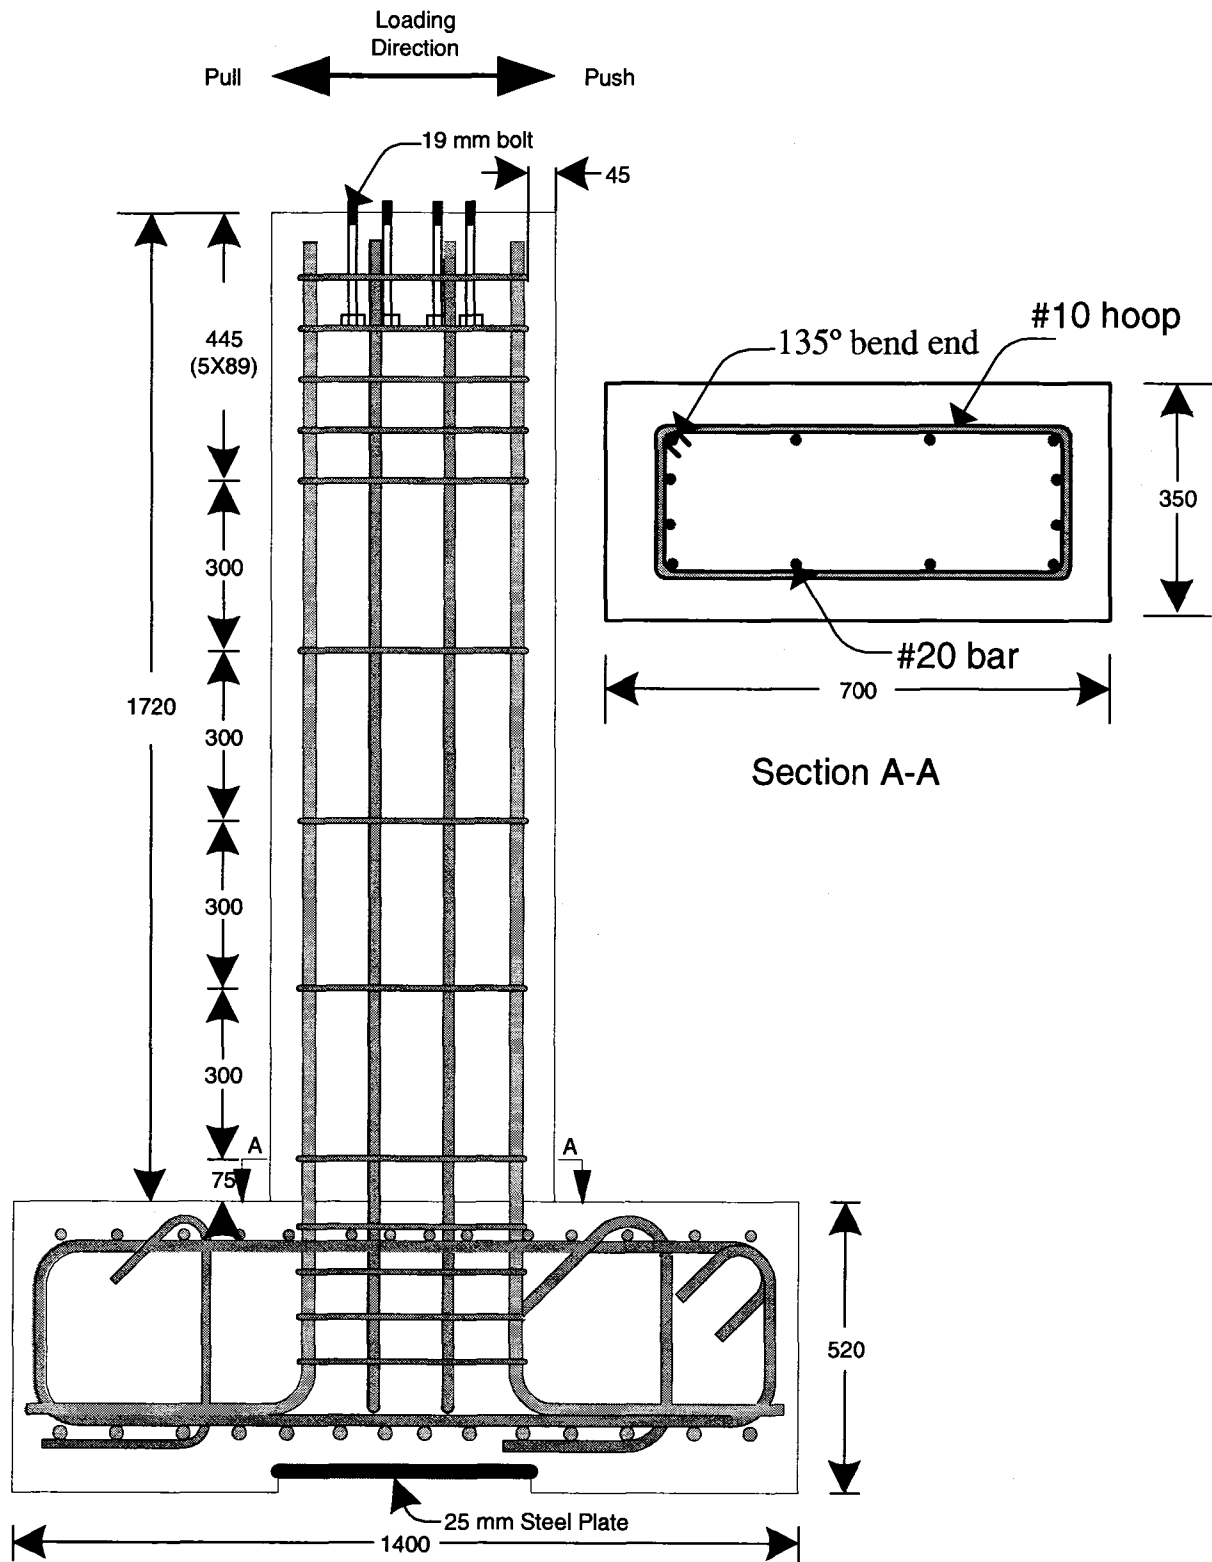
Geometry and reinforcement details for Columns LC-C and LC-R
